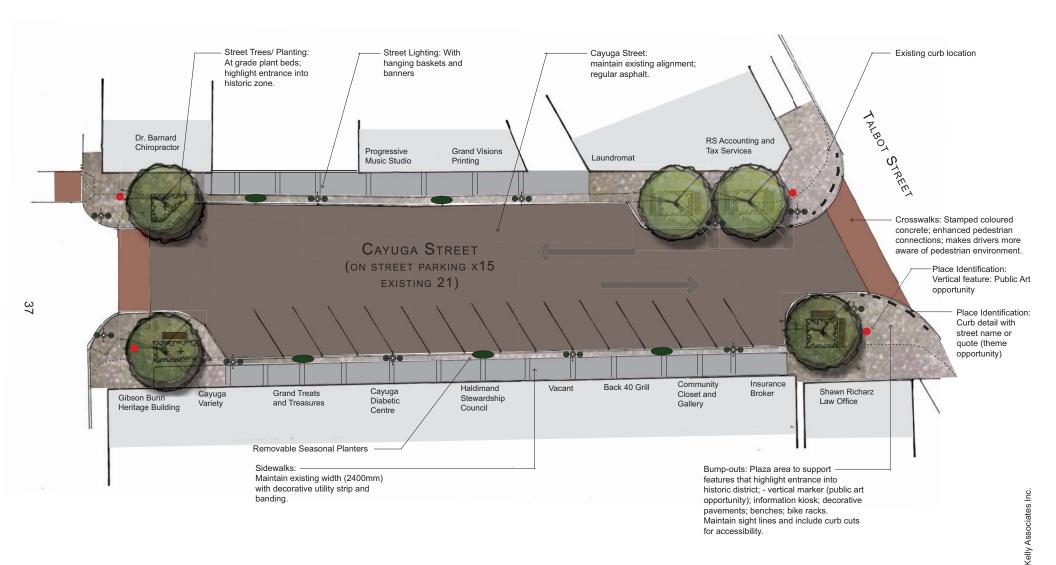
Cayuga Street Detail Two- Way Access- Parallel Parking
